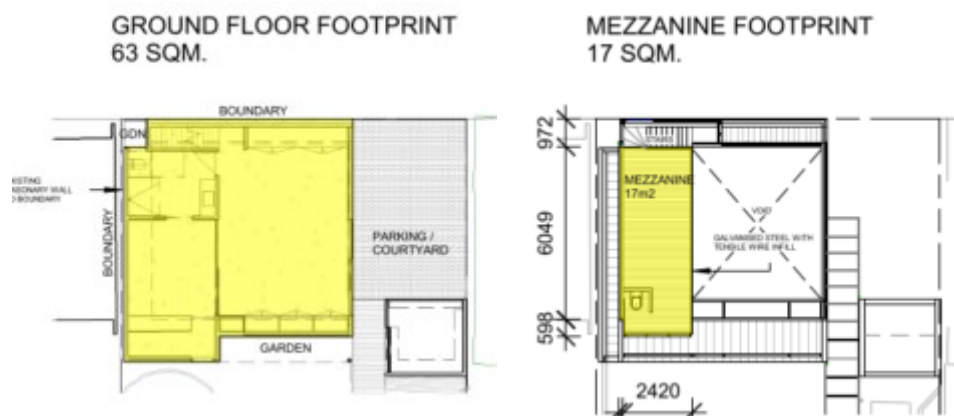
Images demonstrating the floor area of the ancillary dwelling.
